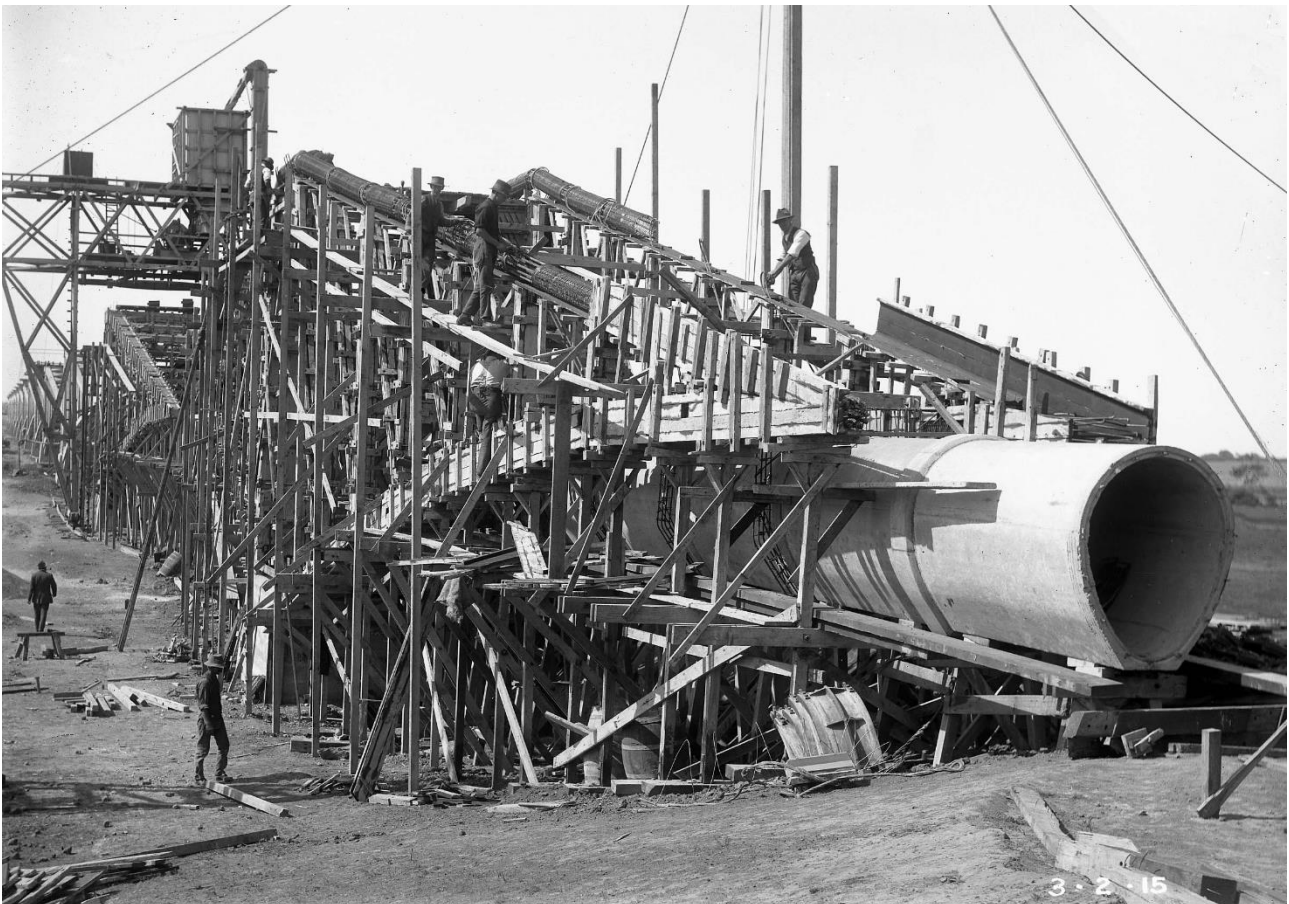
1915 photograph showing assembly of steel reinforcement and timber formwork around the ovoid pipe at the north or south end truss
